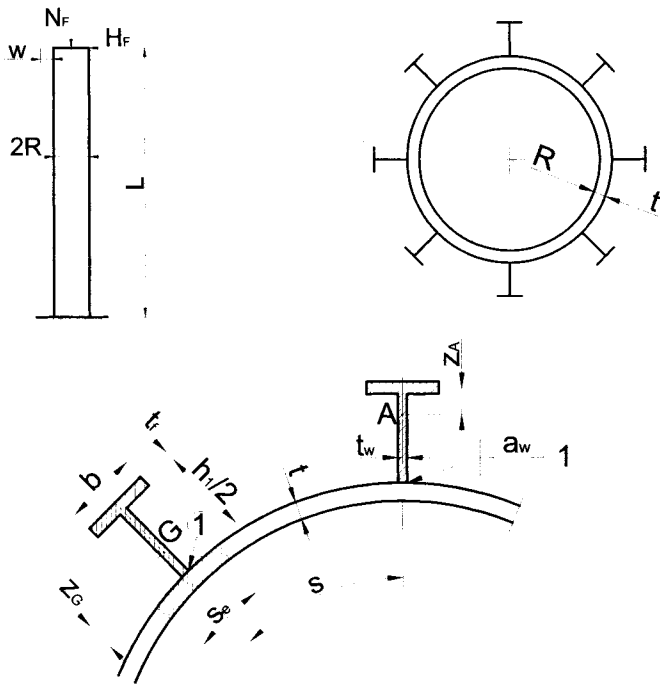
A column constructed as a stiffened cylindrical shell loaded by a compression force N_F and a horizontal force H_F . Cross-section and a detail of the cross-section with outside stiffeners of halved rolled I-section. The horizontal displacement of the top (w) is limited
